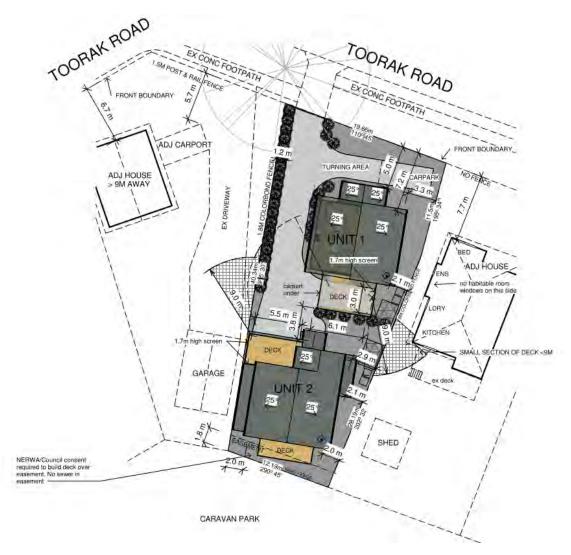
Shows the development layout on site including setbacks and overlooking arcs.
